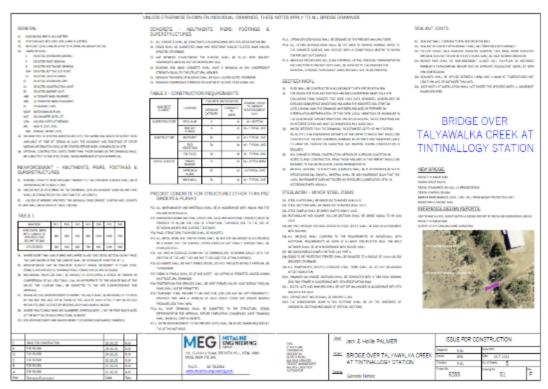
Architectural Drawings/ structural dwgs for installation of preconstructed bridge over Talywalka Creek at Lot3995 in DP 766468, Teryawynia Station,
